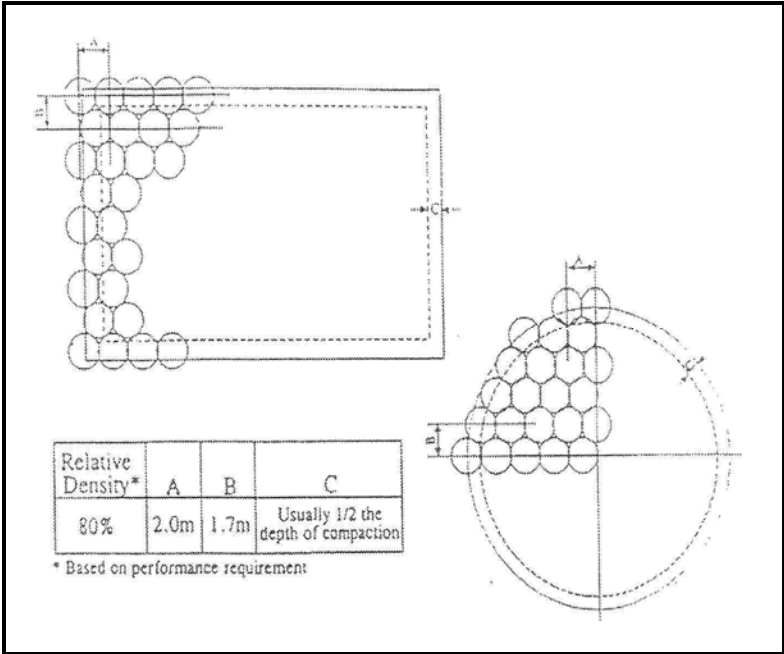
, Typical Compaction Point Spacing for Area Layouts (Ground Improvement Methods – August 2006)
